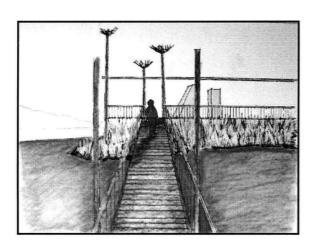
Perspective sketch showing floating boardwalk leading up to Highwater deck.
